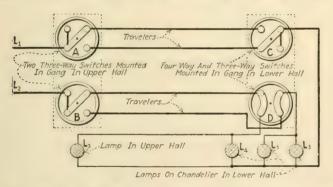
Restricted control of up-stairs and down-stairs hall-lamps from two locations. See Fig. 266A for installation lay out.
